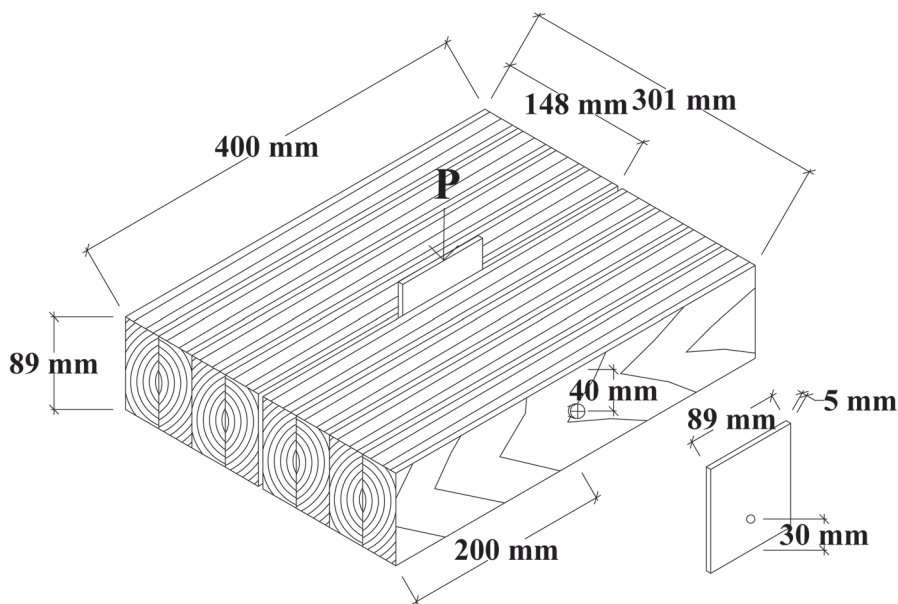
Shearing test of a glulam member assembly with an aluminum connector with pressure (P) applied perpendicular to the grain.
